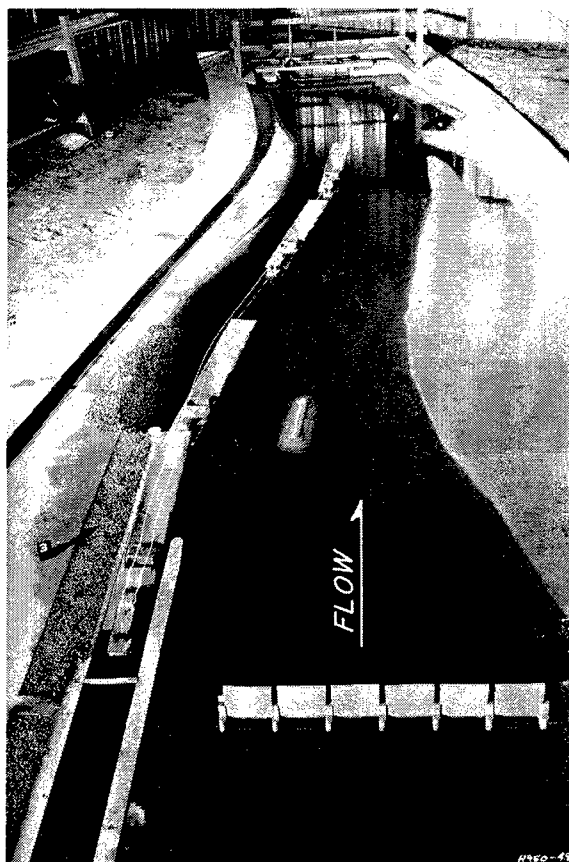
Plan B, looking downstream, discharge 22,500 cfs, showing path of downbound tow leaving lock near midchannel
